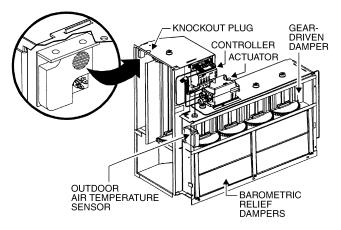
Mounting the Sensor and Bracket in a Horizontal EconoMi\$er Assembly
